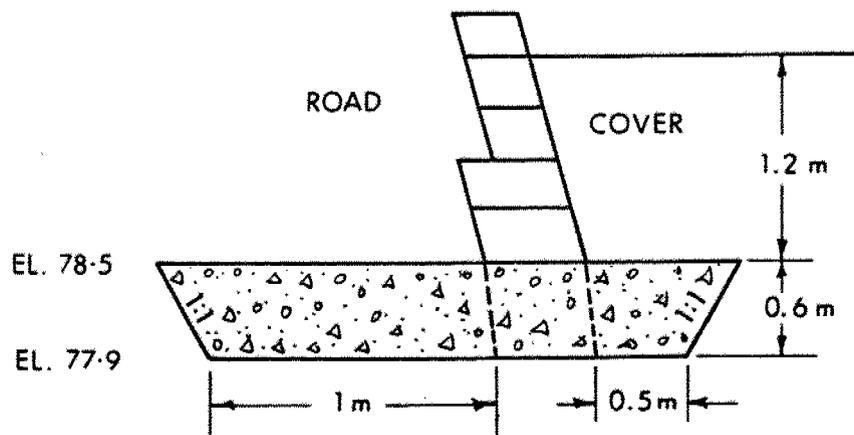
PISA WALL (sta. 0+310 to sta. 0+315 )
